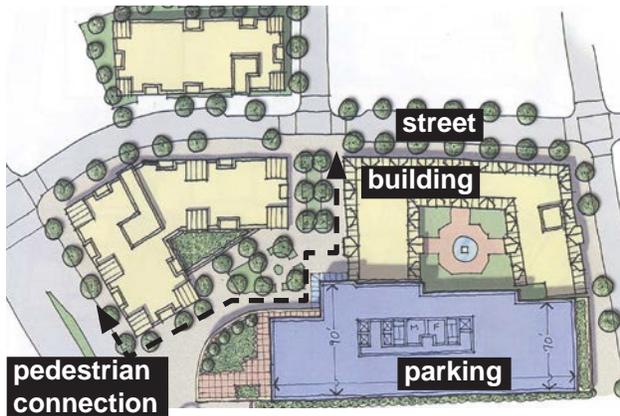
c.13: Site plan with access to parking behind buildings fronting the street and connections through the site to surrounding streets
